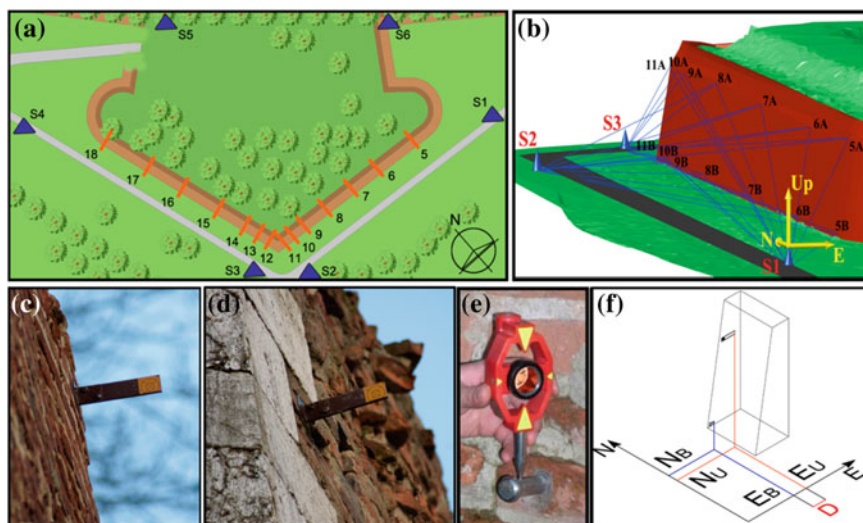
a Plan of the 2D network (6 vertices and 14 sections); b local reference system and scheme of measure for the South wall; c, d target bounds masonry by a steel plate at 5 m from the ground; e marked benchmark at 0.5 m from the ground; f computation of the segment *D*, difference between the East coordinates of the targets on the South wall
